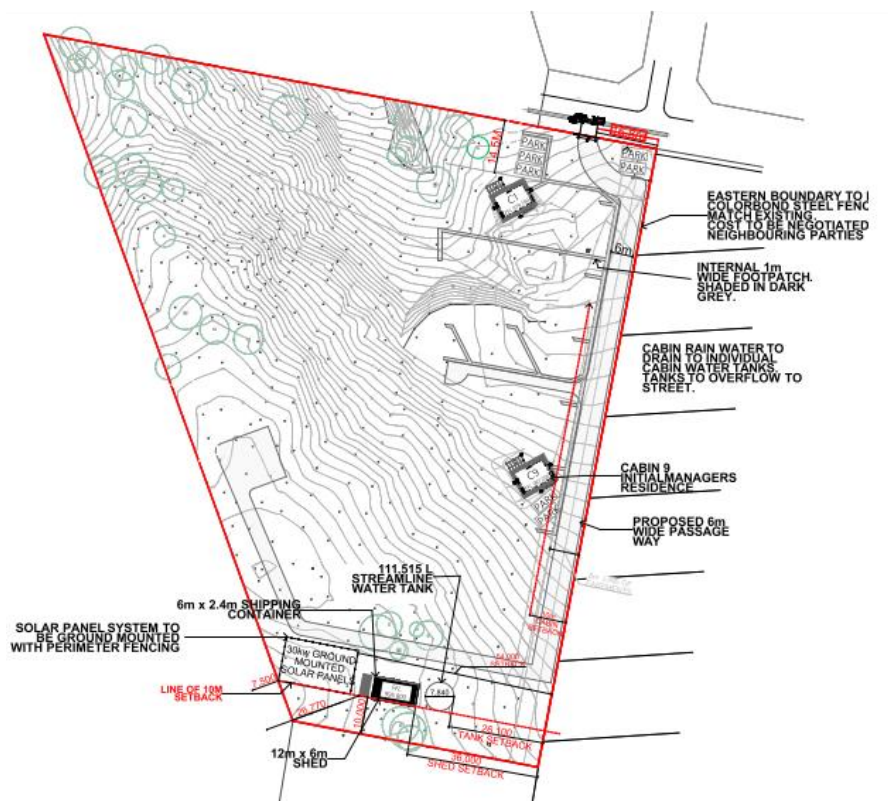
Proposed Site layout – Stage 1 (Cabins 1 & 9 (temporary manager's residence and bushfire refuge), storage shed, solar panels and shipping container)
